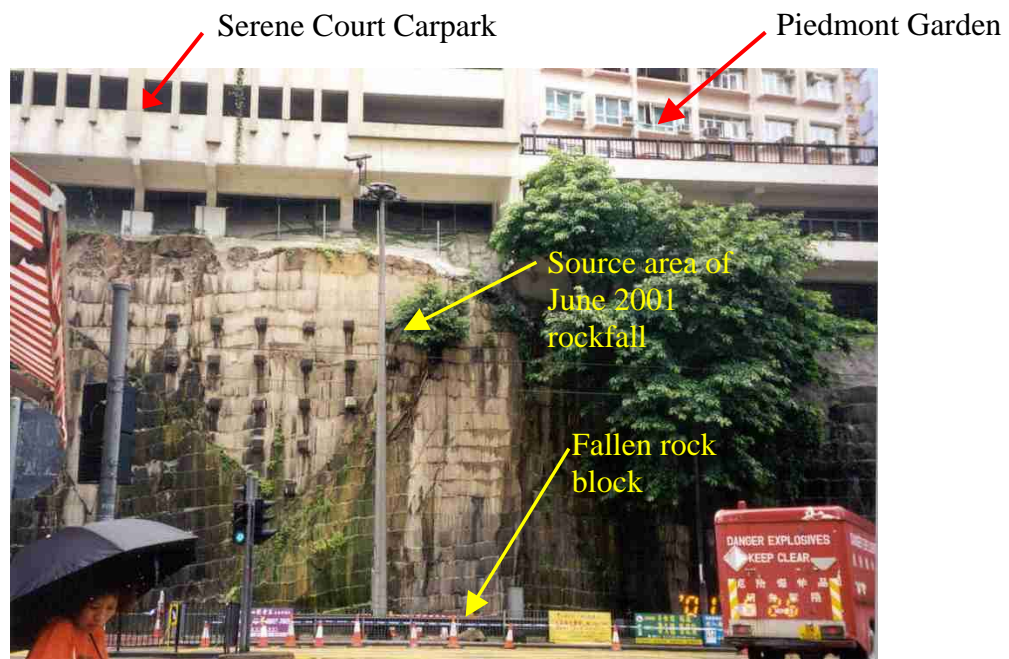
View East across King's Road towards Slope No. 11SE-A/C561 Showing Large Bolted Wedge Exposed in Slope Face, Source of Fallen Rock Block and Location of Fallen Block at Road Level (Photograph Taken on 26 June 2001)
